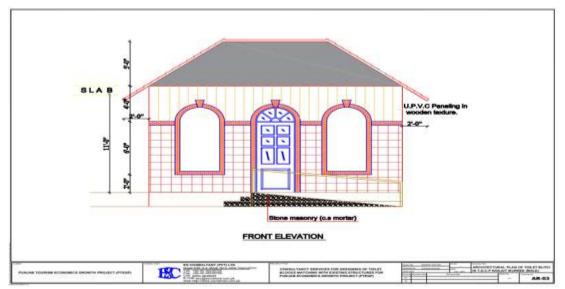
Front Elevation for New Toilet(male) Block at TDCP Hilltop Resort Khajut
